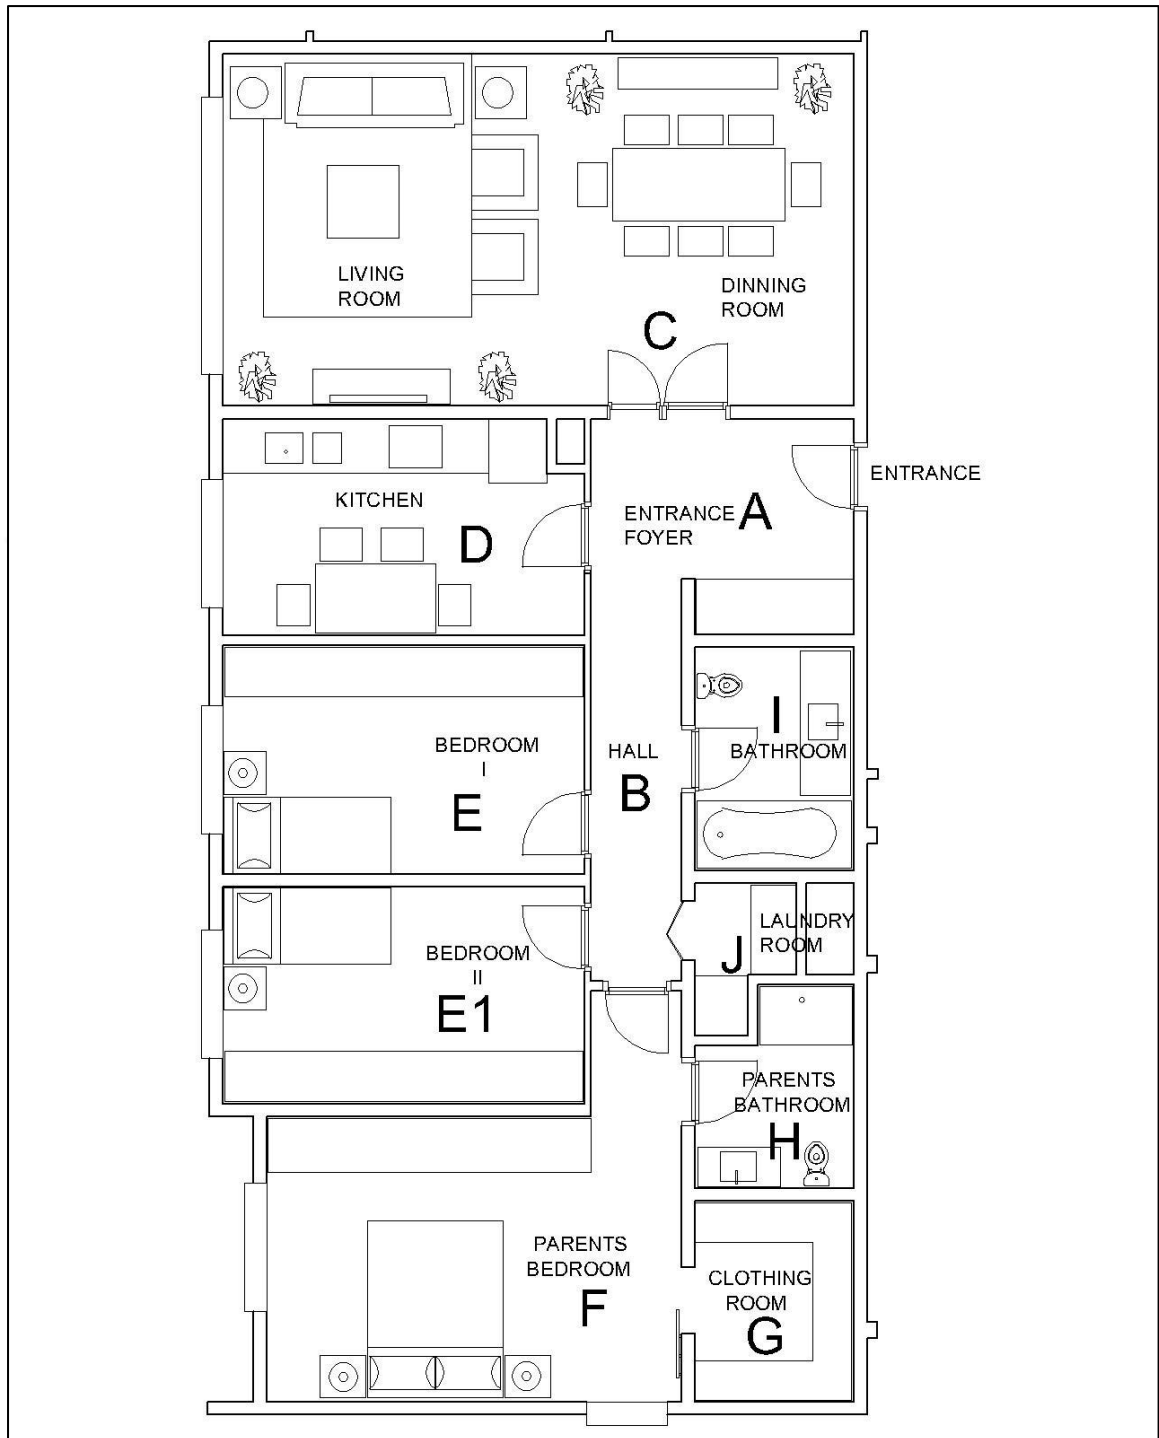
Existing apartment floor plan. Standard furnishing, designed by author.
